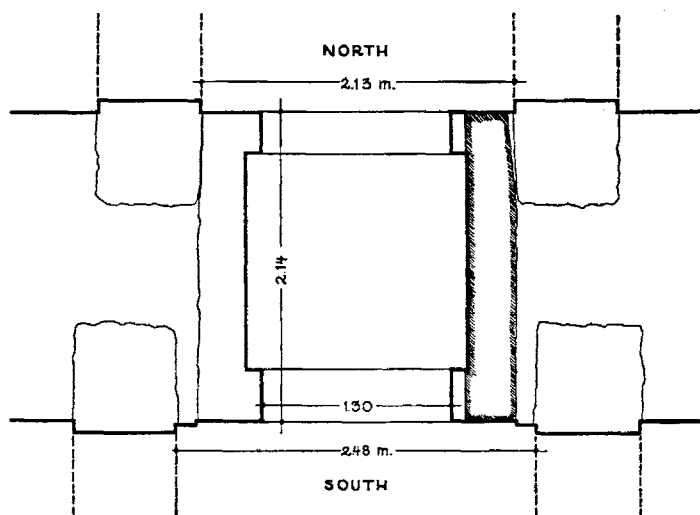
GROUND PLAN OF THE DOORWAY BETWEEN THE GREAT COLUMNED HALL AND THE THRONEROOM OF THE FIRST PALACE
